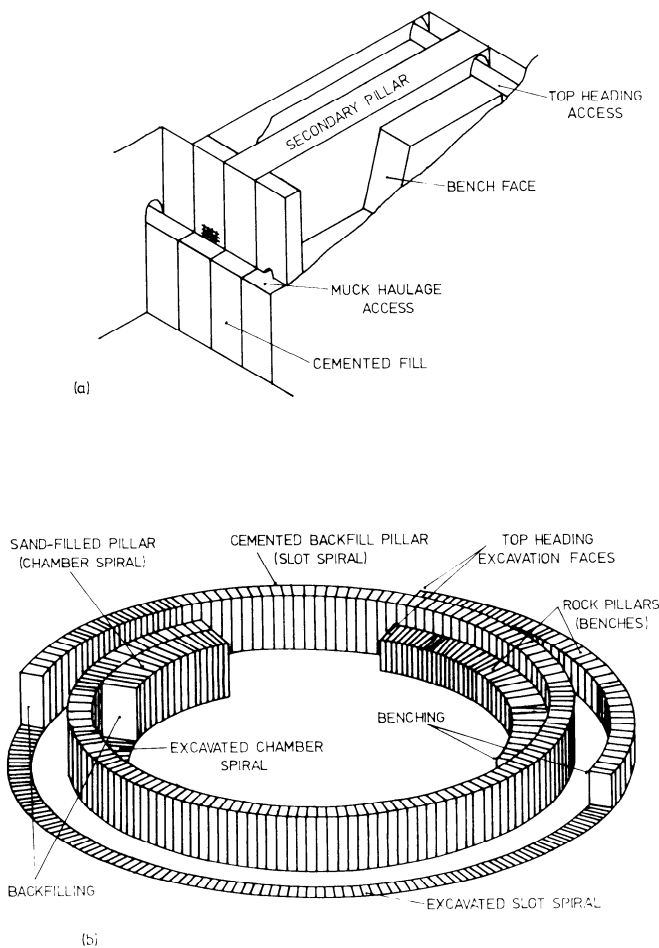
(a) Slot and fill mine layout (after Brechtel, 1987). (b) Spiral slot and fill mine layout (after Dixon, 1990).
